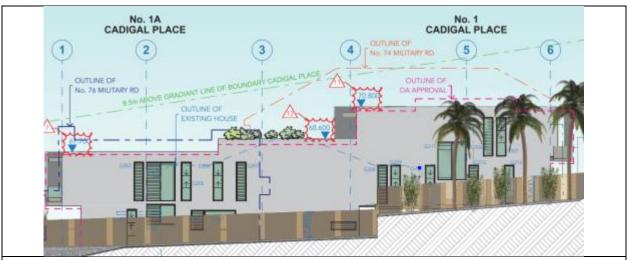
Southeast elevation showing DA approved wall height and proposed modified wall height
